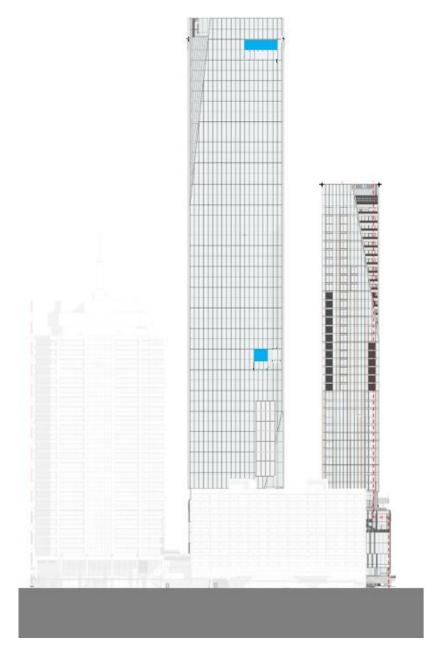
North elevation (at Quay Street) with signage zones highlighted.
